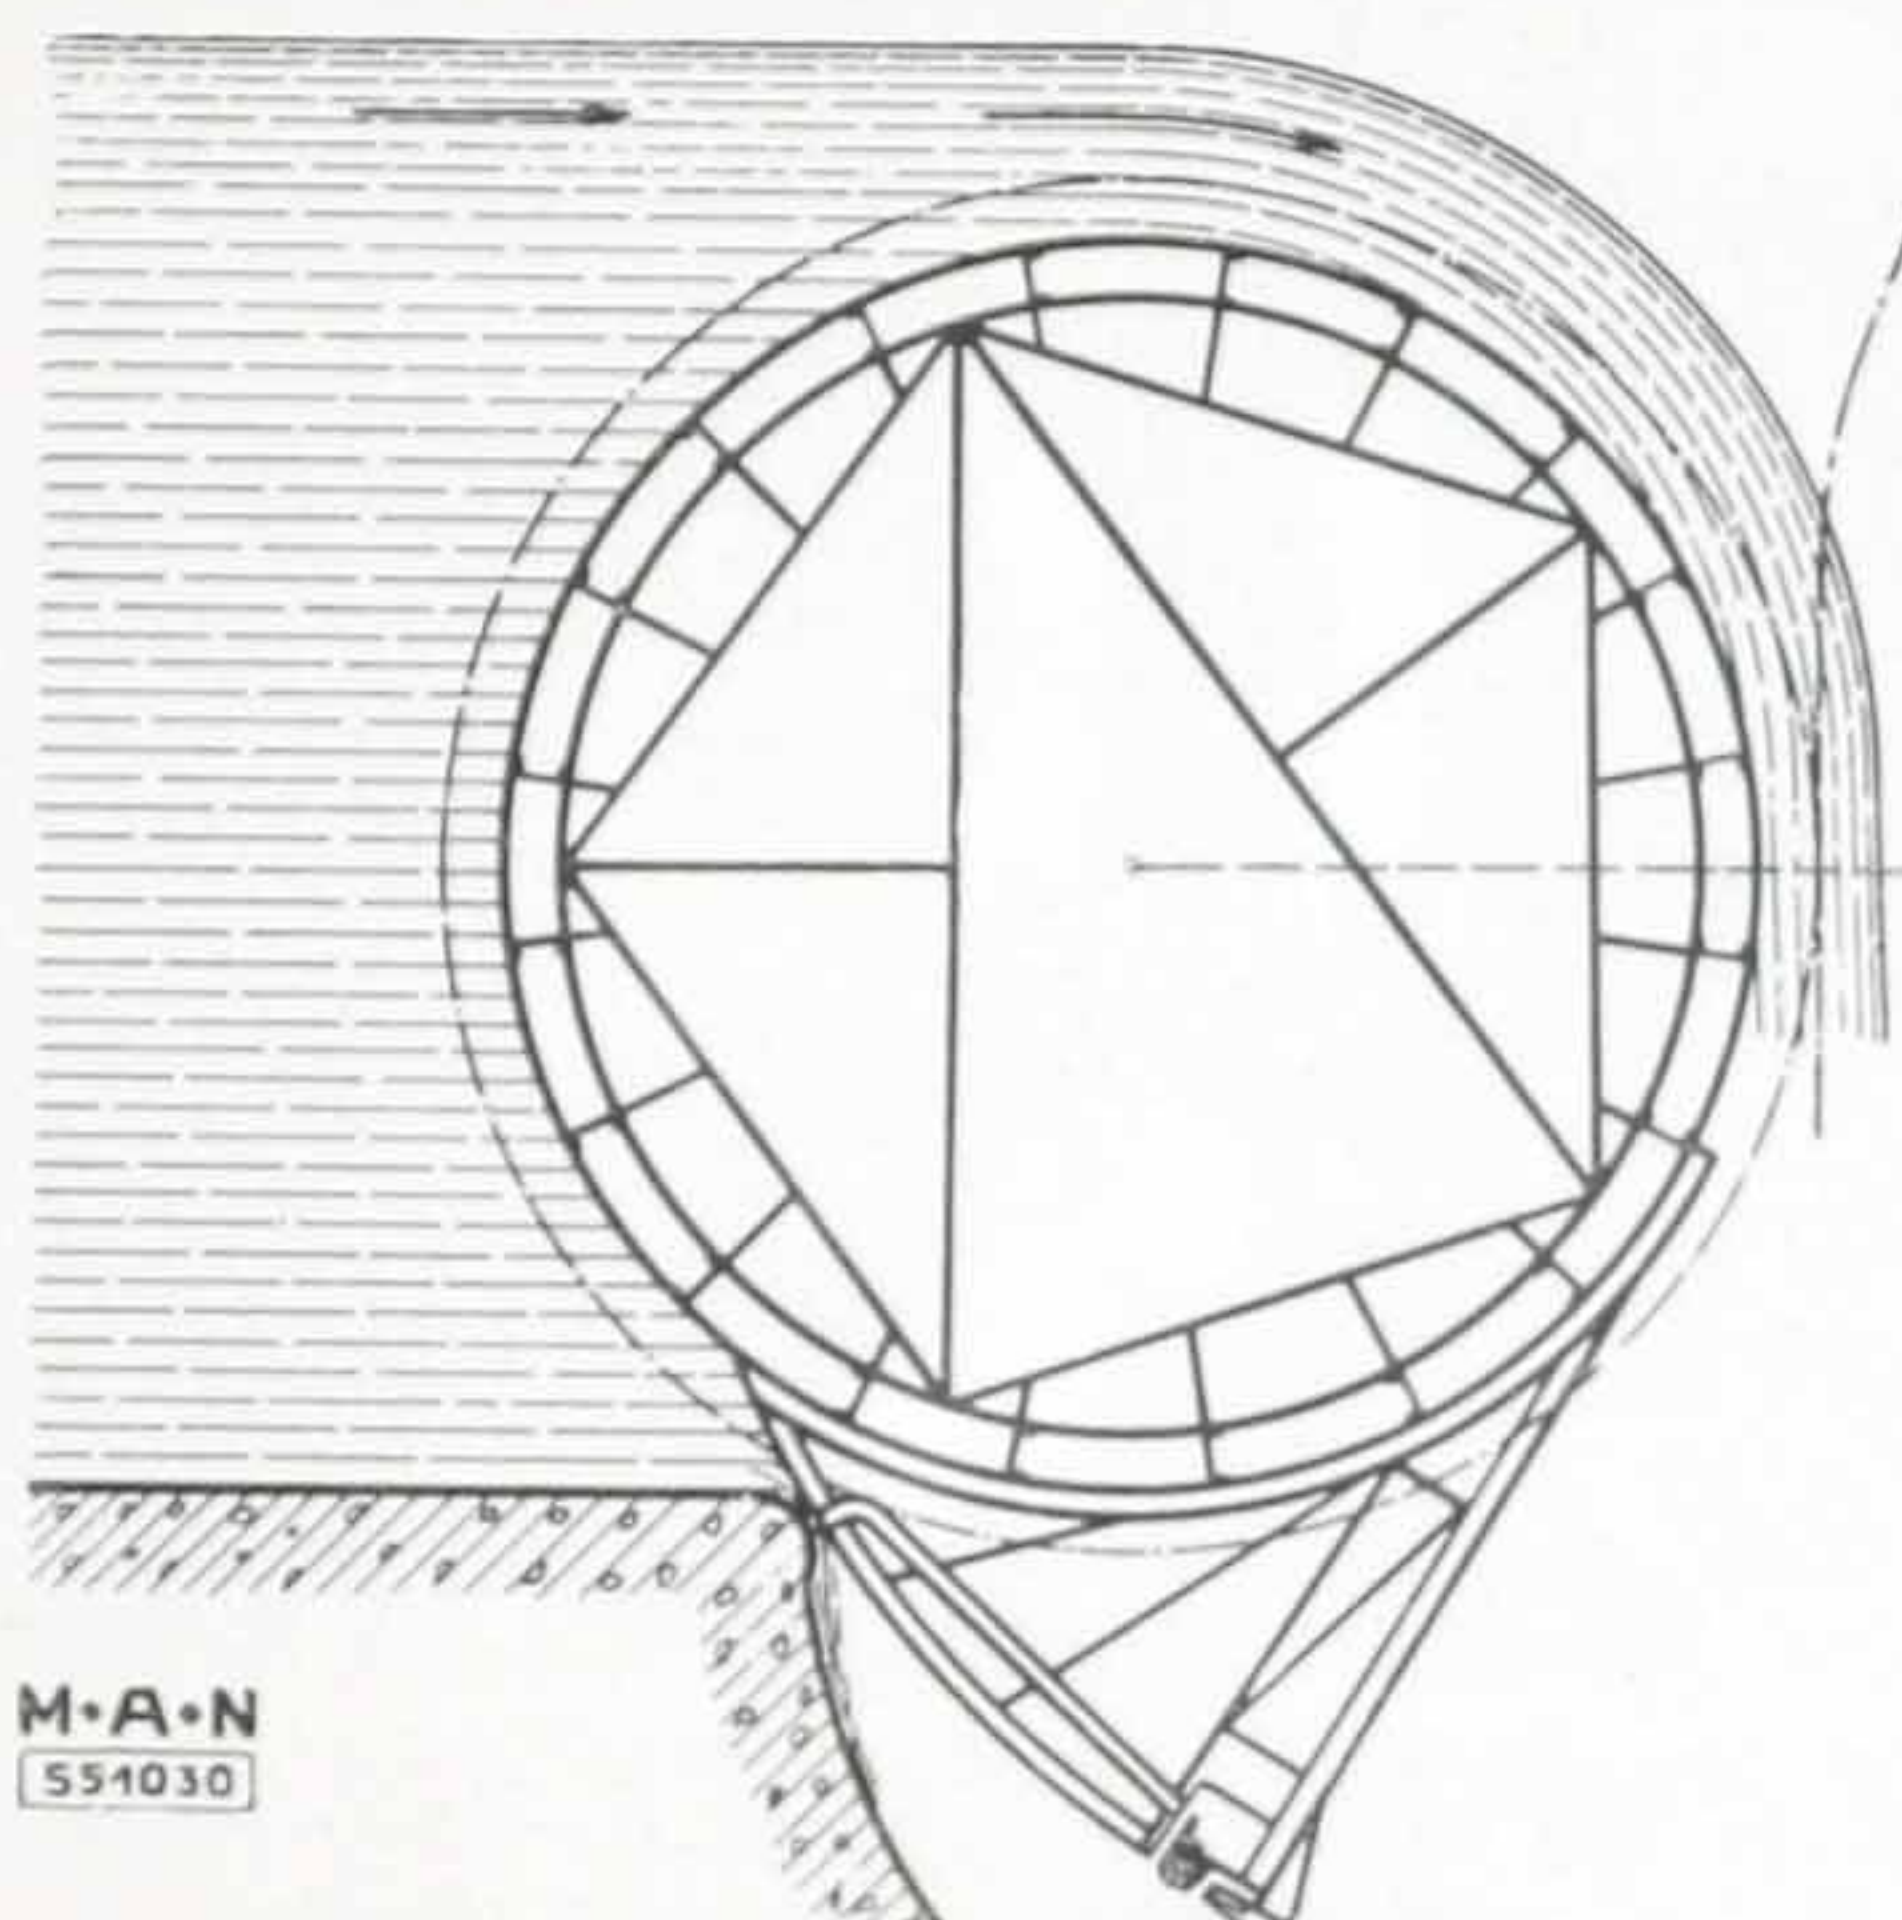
Submersible roller weir with bottom sealing (new design), submersed.
